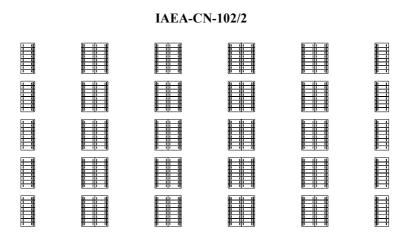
General plan view for 10000 spent fuel element dry-storage installation.
